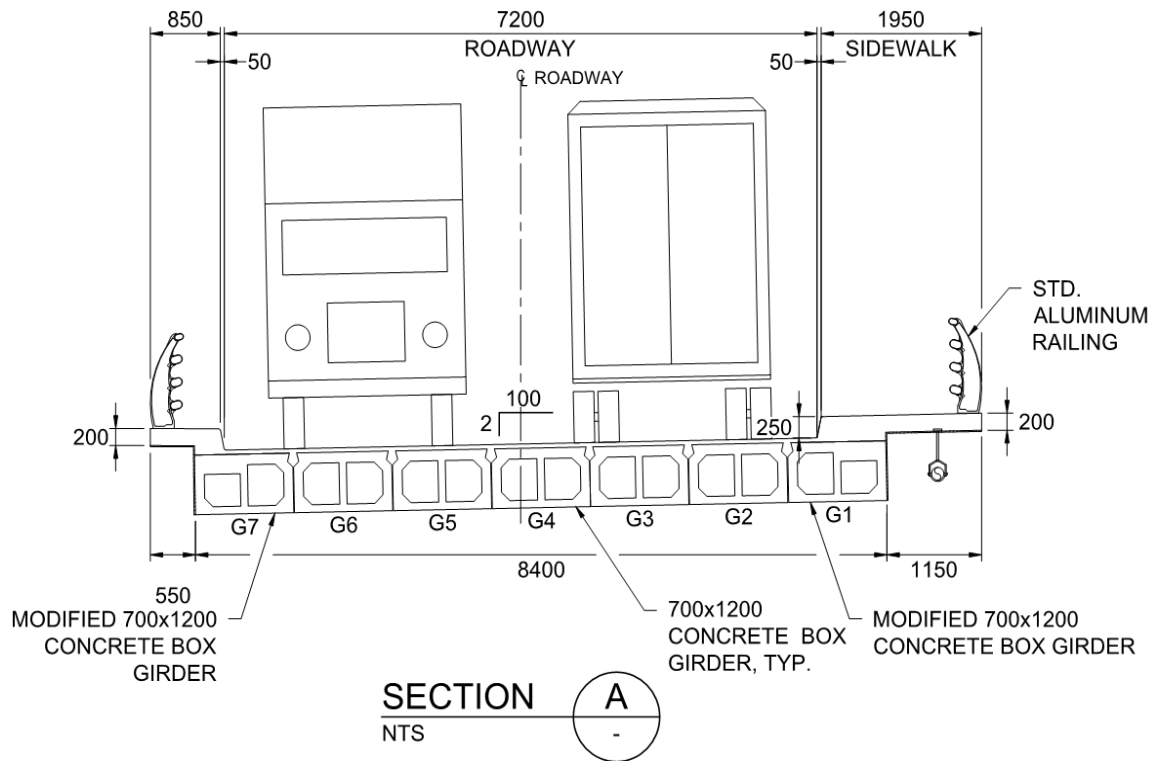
Bayview Road Bridge over Alberta Creek – Section
